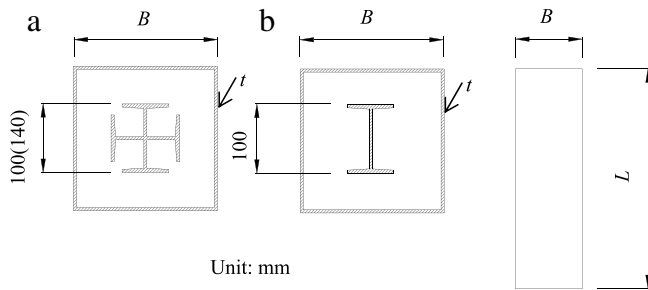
Test specimens: (a) Cross-section of specimen with cruciform steel section; (b) Cross-section of specimen with I-shaped steel section.
